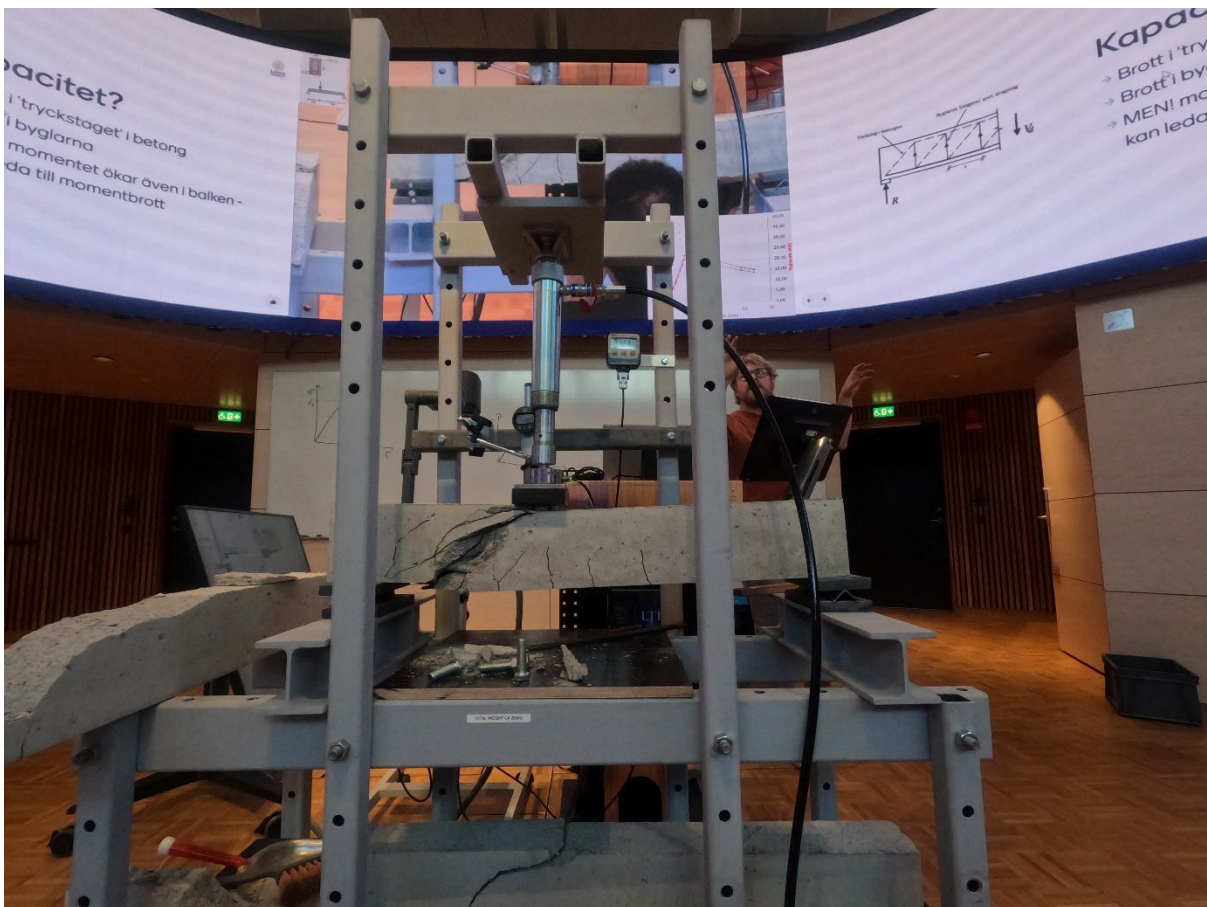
A mobile mini material testing rig used in class to test a small concrete beam (in this case in shear). Previously tested beams also seen on figure.
